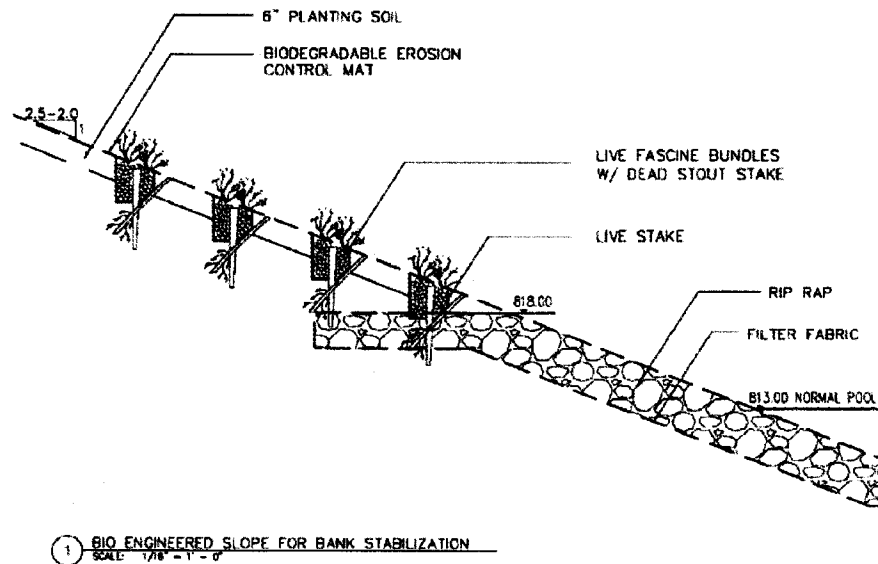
Propose shoreline stabilization plan (Hargreaves Associates, 2008).
